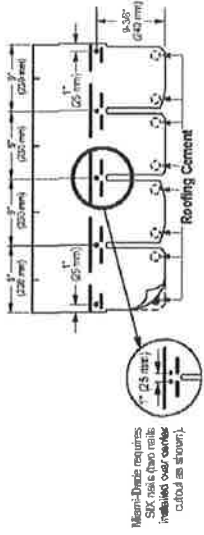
Use FIVE nails and eight spots of asphalt roofing cement under each lab corner.
